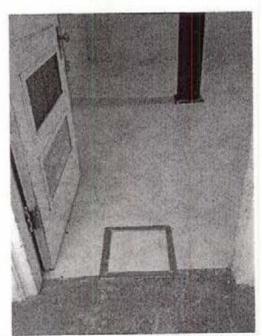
Lead wipe floor sample 120612-WWA-10 collected from entrance of Converted IFR.
